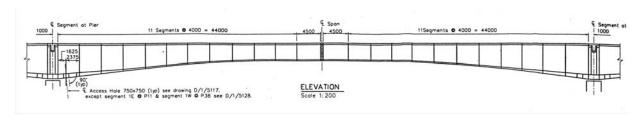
Typical bridge span (Type-C) (source: JMB As Built Drawing).
